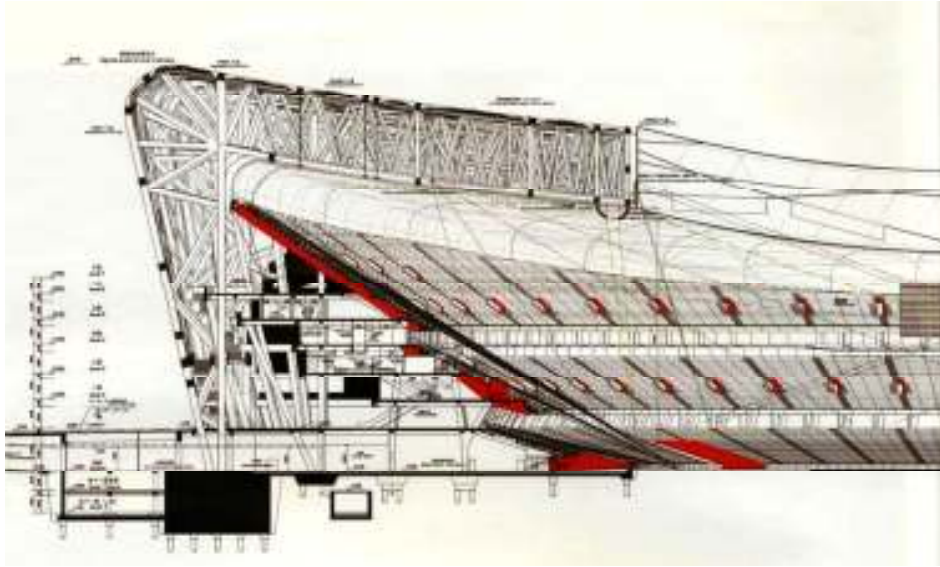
North-South Section through bowl and “Nest” structure. (Brown, 2009:12)
